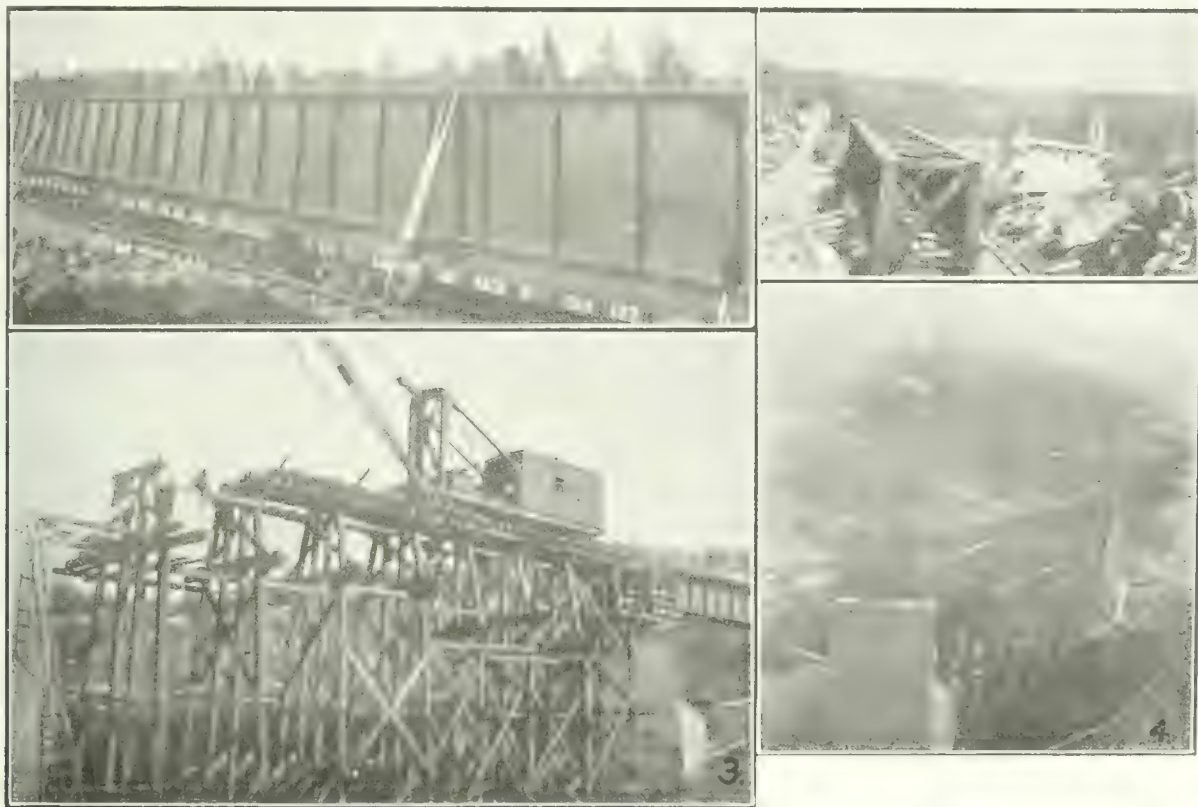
A 130-ft. Girder on Cars. Fig. 2.—Span (130 ft.) assembled.
